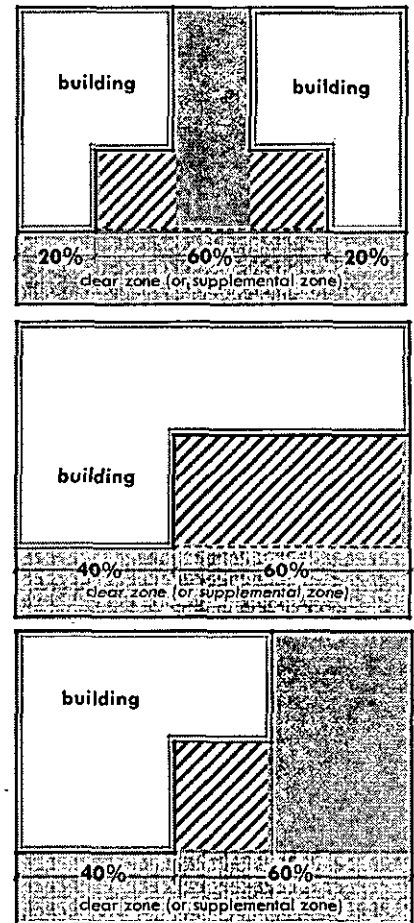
Examples of building placement on urban roadways. Parking is generally not permitted in the hatched area between the building façade and the sidewalk, except for shallow lots, as described in paragraph D.
